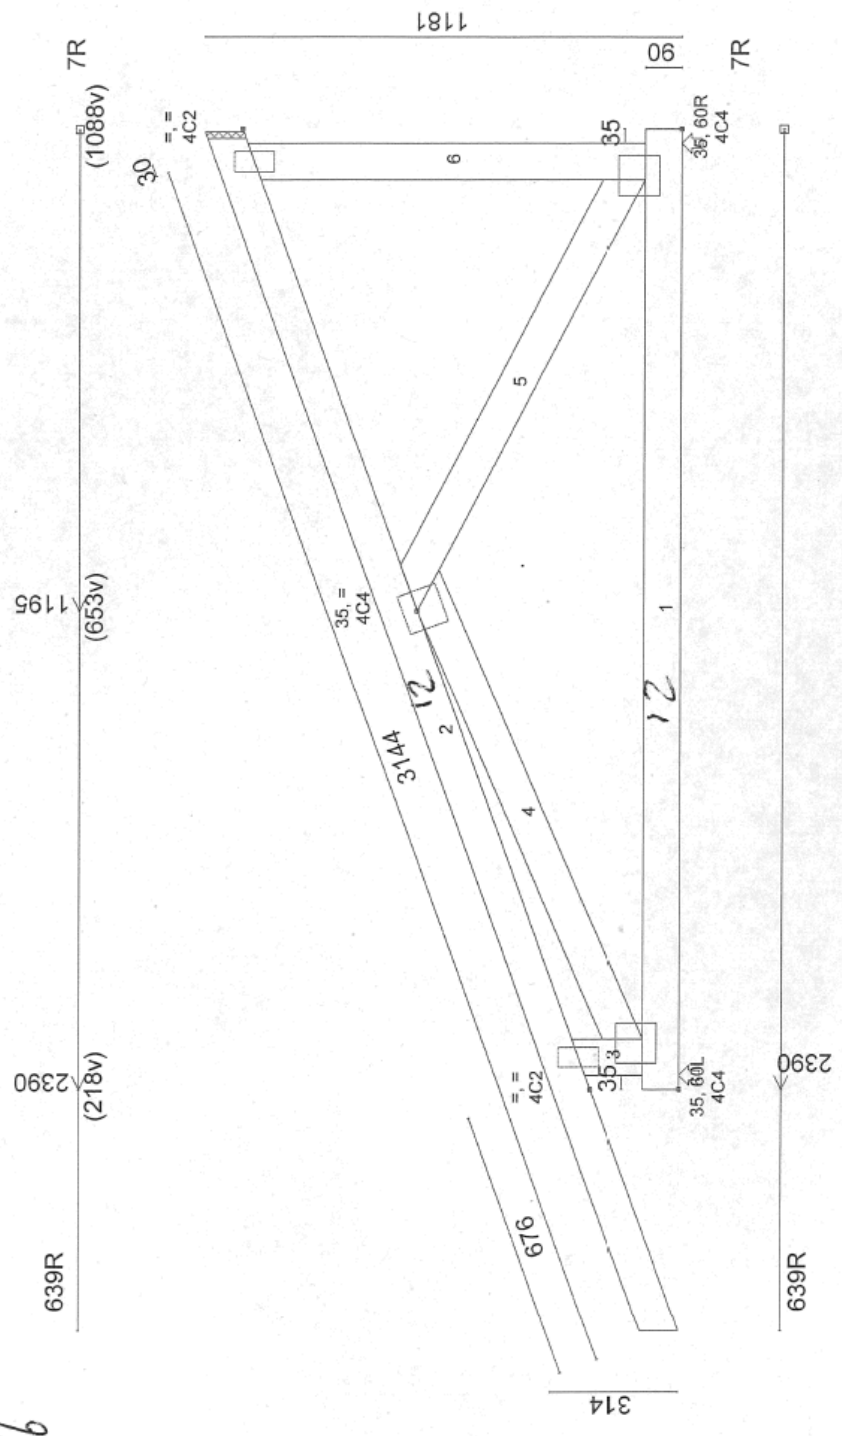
Test Cell 1 – Roof-framing Data: Truss C2 (not to scale)
